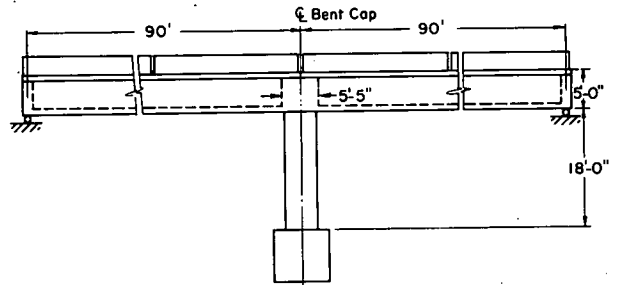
Cases 6-11, Part 2, Double-Column Bridge Elevation
